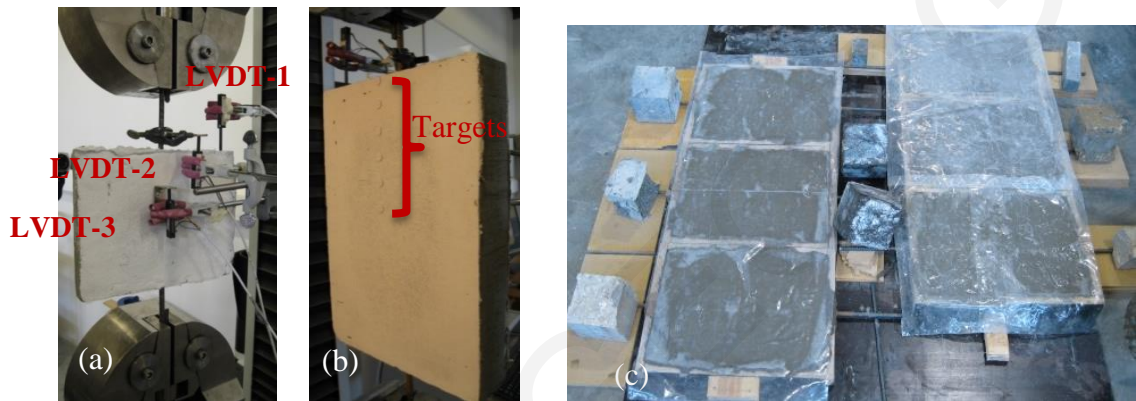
(a) Test setup for pull out tests with LVDTs measuring equipment, (b) targets and (c) casting of the specimens
